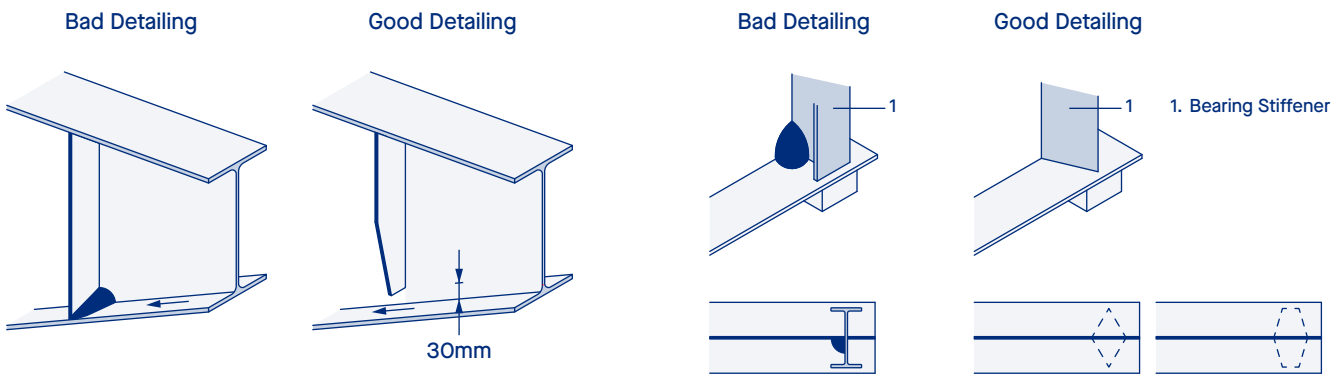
Curtailing transverse web stiffeners to allow drainage below
